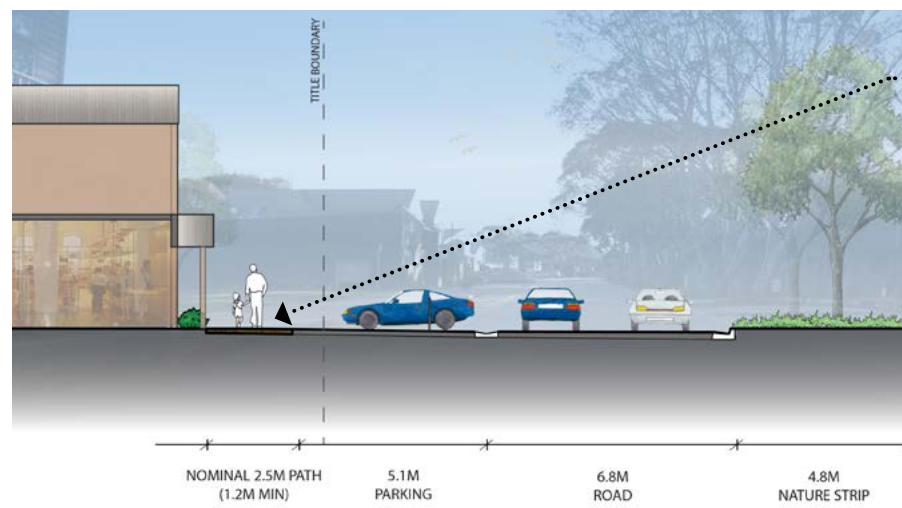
Proposed Big Muster Drive - Core Commercial / Retail Precinct - Castran's Corner to Tower Road
